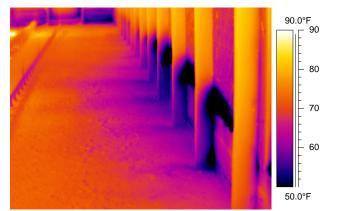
Air leakage due to ice forming at the bottom of an unstripped side wall curtain.
